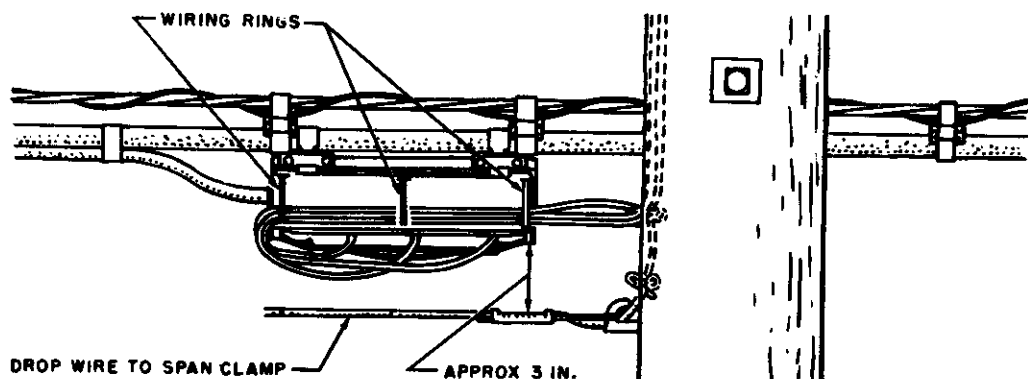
Typical Arrangement of Wires and Attachments Strand Mounted Terminal, Rear View
